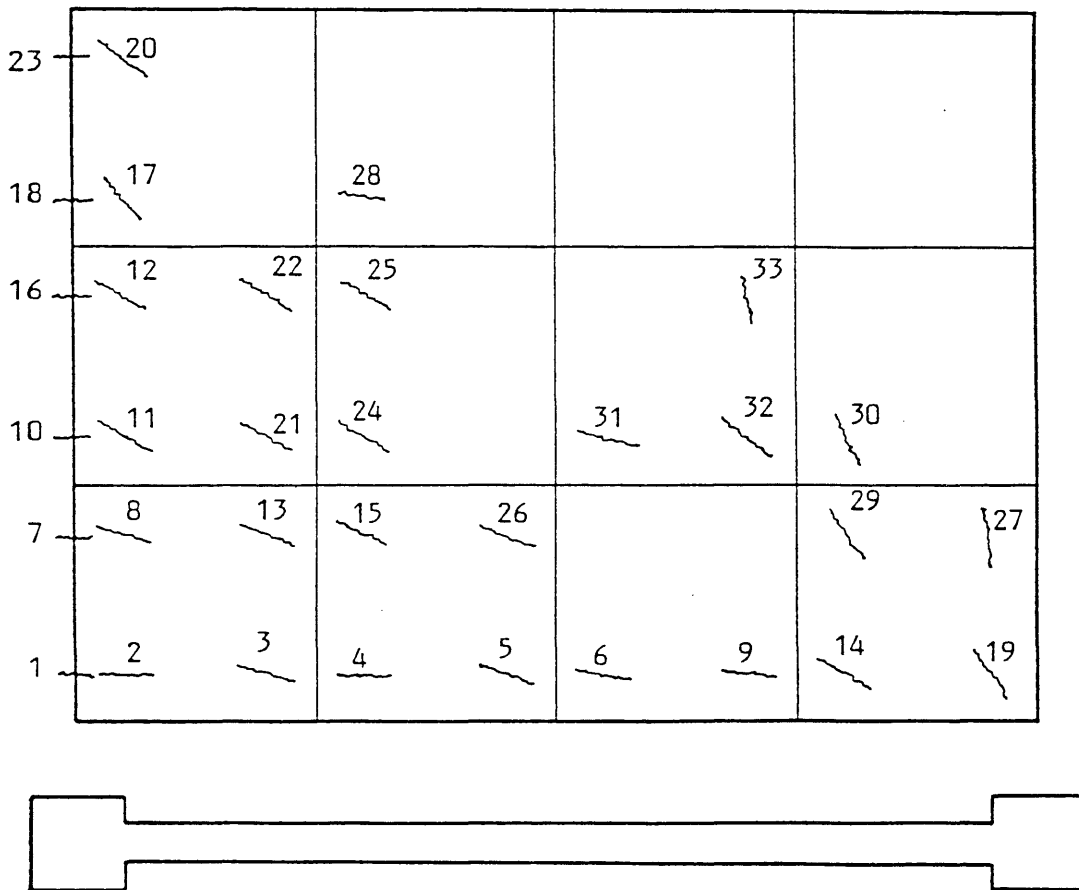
Crack distribution and orientation in the shear wall at yielding of reinforcement in the tension end column (load step n. 119). Numbers give the cracking sequence.
